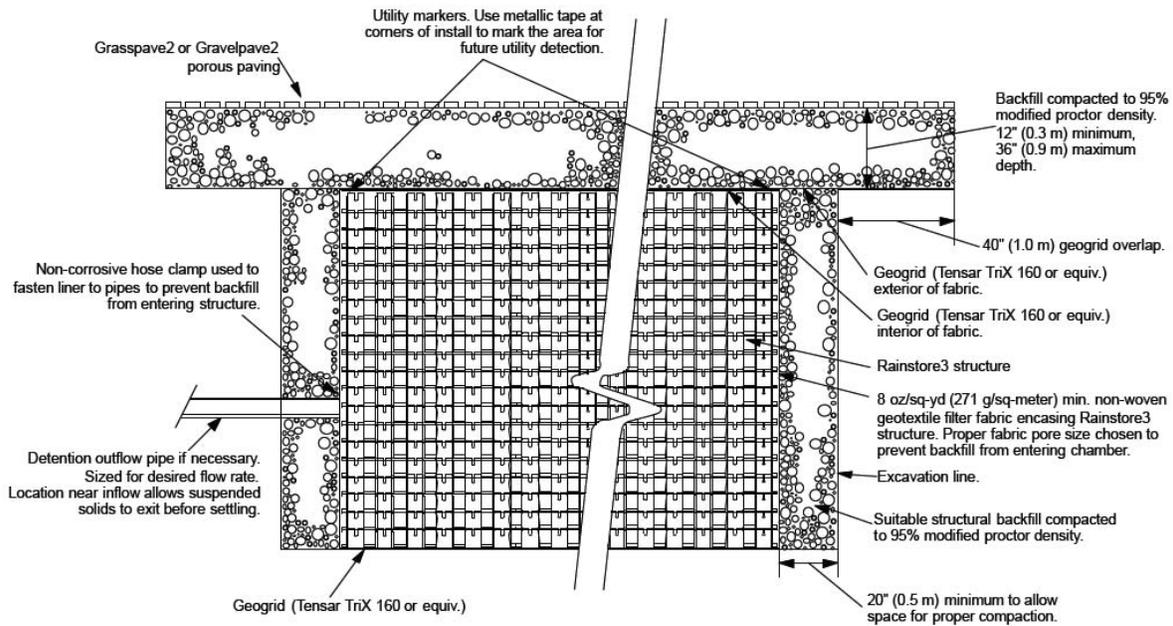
Cross section of modular storage system. Source: http://www.invisiblestructures.com/design_details/rainstore3_details/RS3porouspaveinflow10.pdf.
